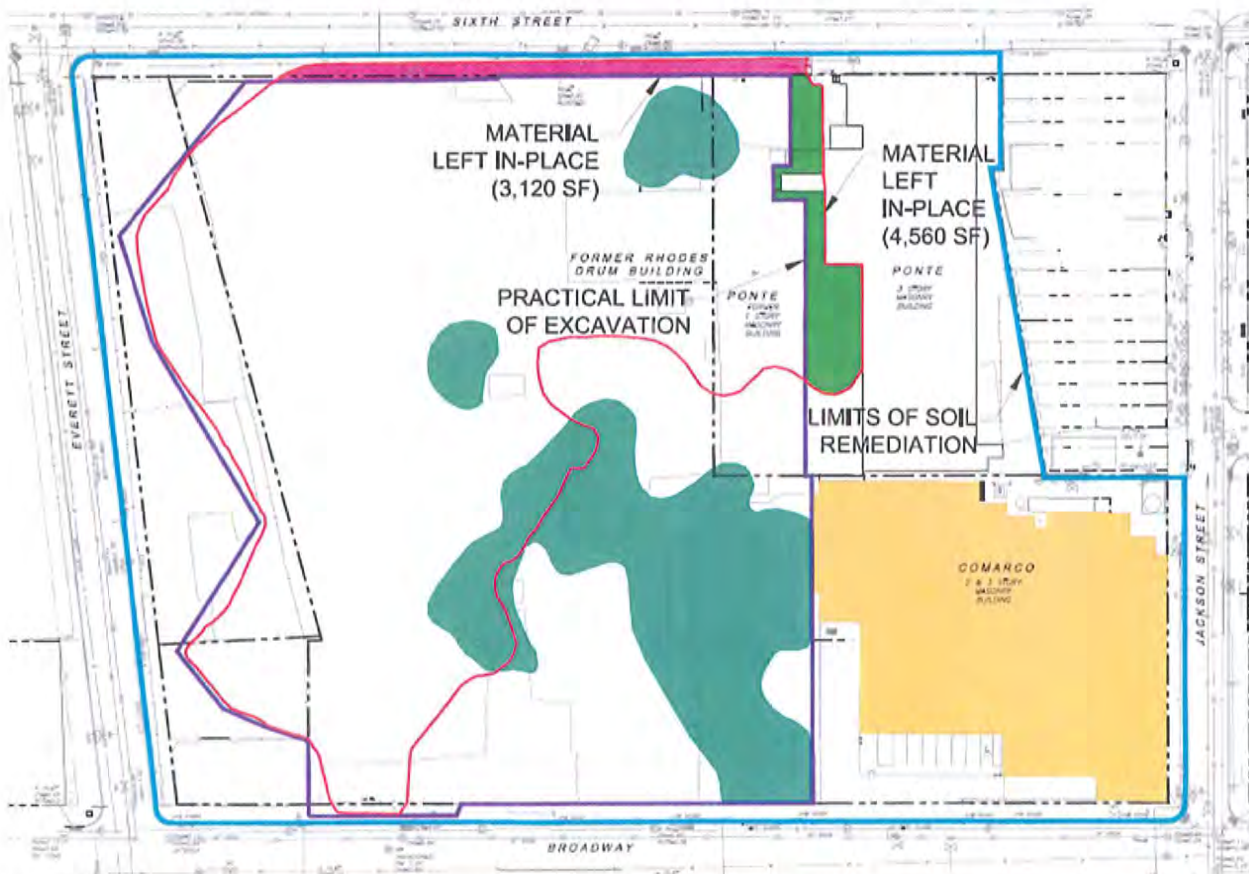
Plan view showing the locations of arsenic-impacted materials to be left in-place below the 6th Street sidewalk and adjacent to Ponte Equities 3-story building
